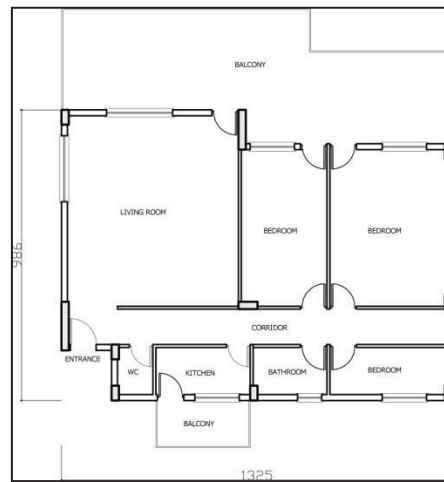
Floor plan layout of OD (Source: İSDEMİR Archive, 2012 and revised by author)
